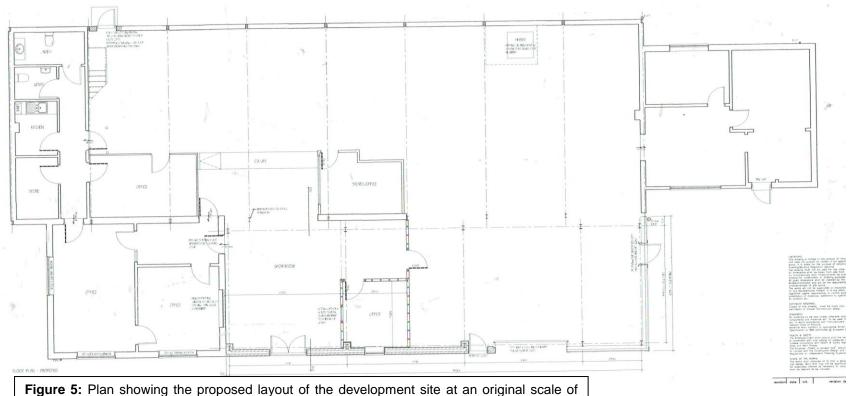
Plan showing the proposed layout of the development site at an original scale of 1:50 at A1, (not to scale), (extract from Architects plan)
